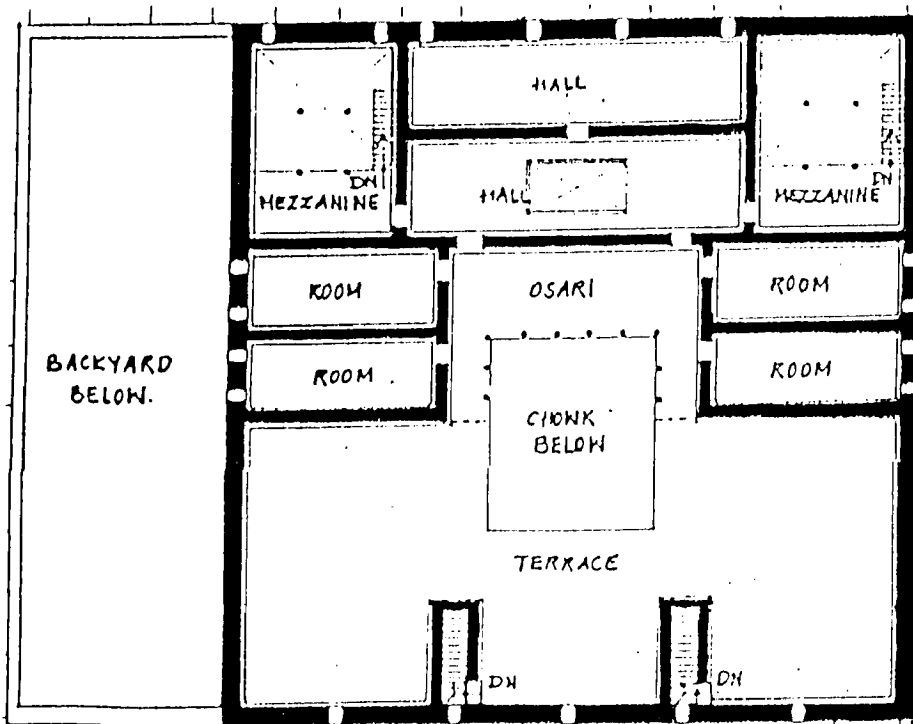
First Floor Plan of Baswaraj Patil House.
